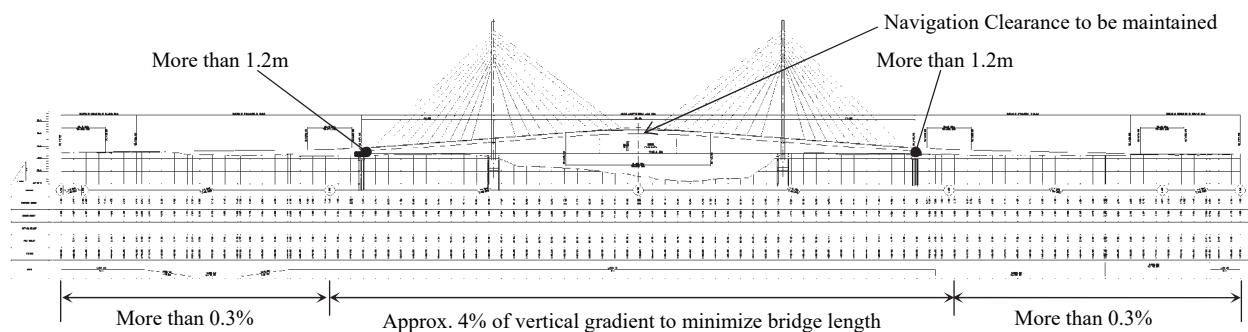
Horizontal Alignment of Gyaing Zathapyin Bridge
